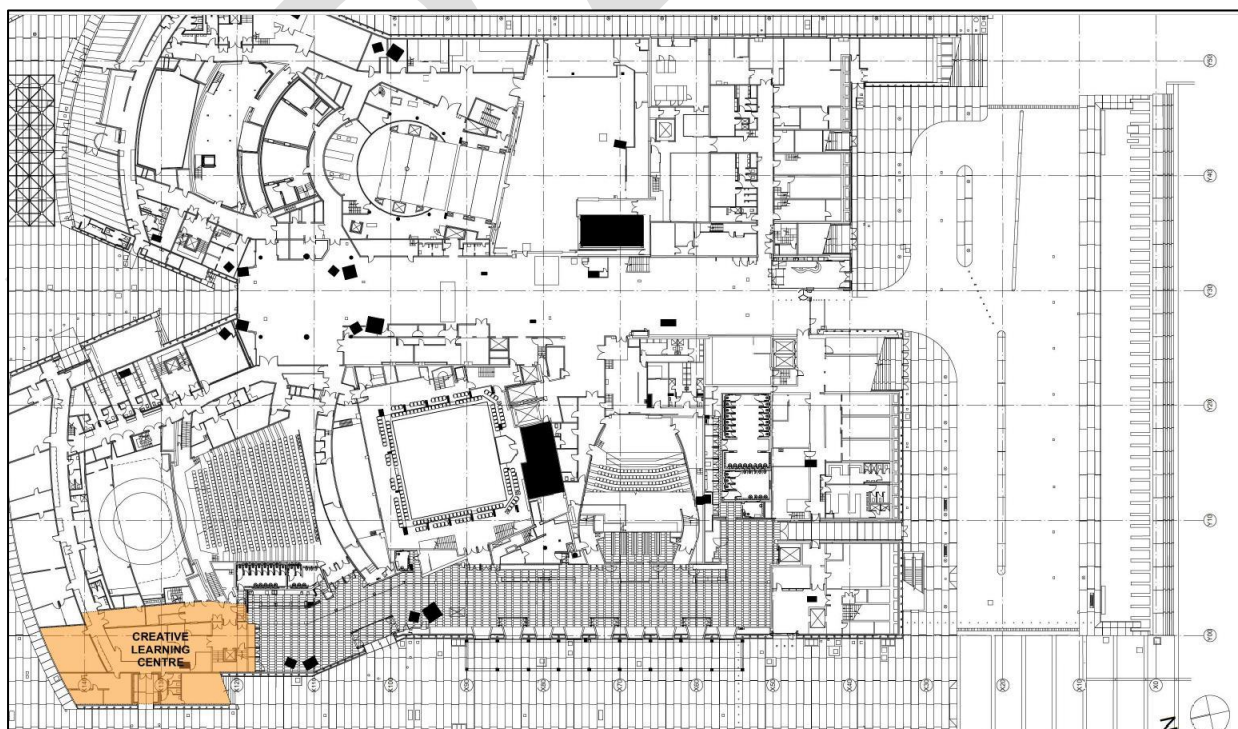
Creative Learning Centre location plan (Source: TZG Architects)
